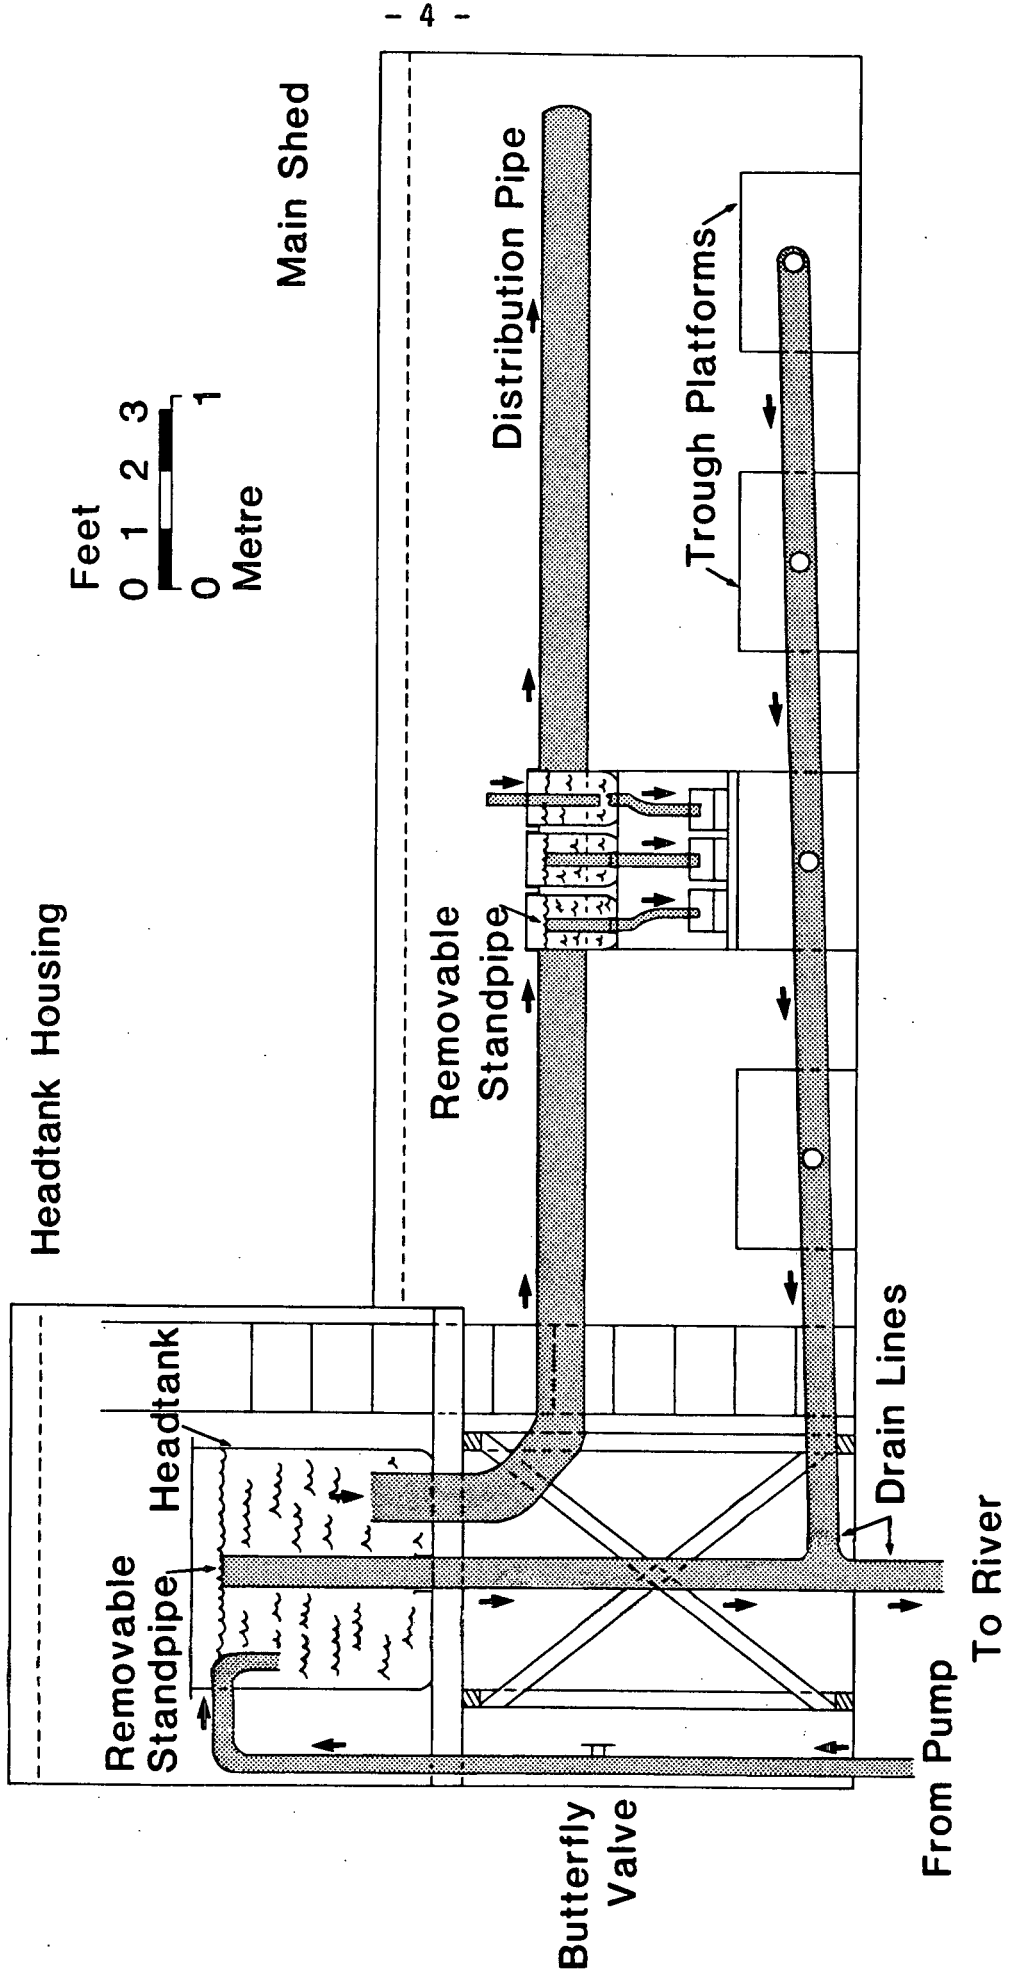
Diagram showing details of multiple trough apparatus; longitudinal section.
